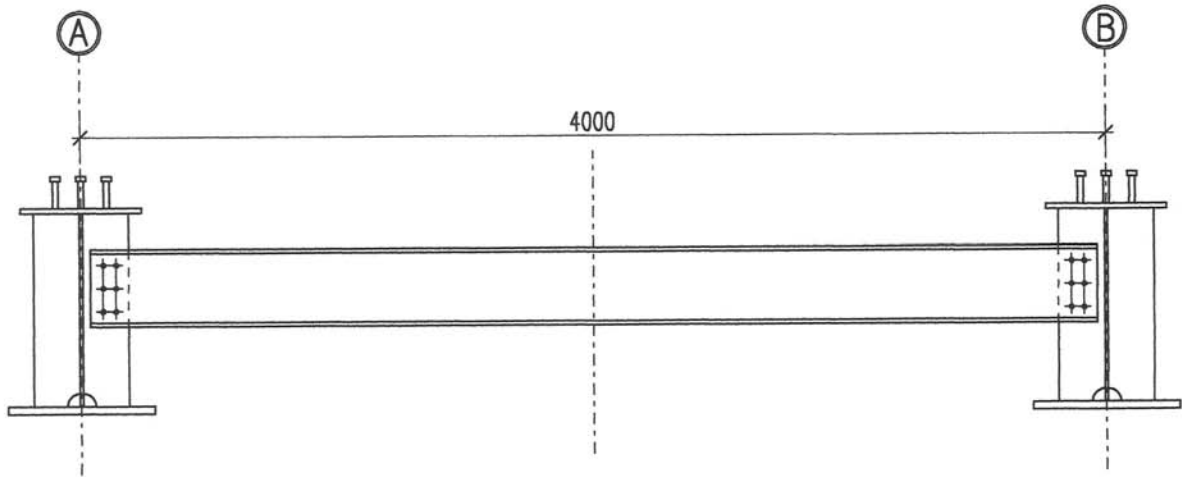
Crossbeam made out of hot rolled UPE 300.
